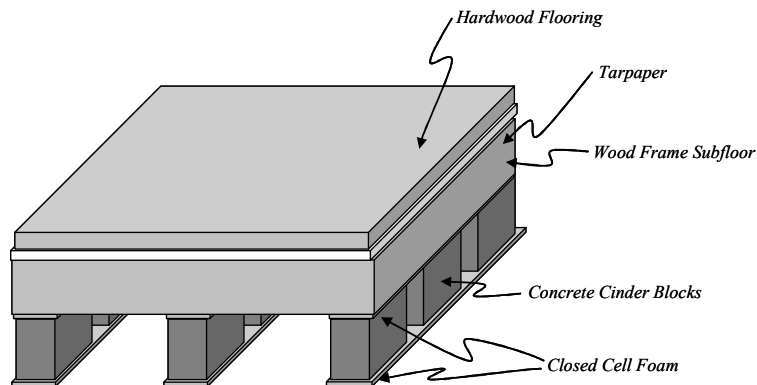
(c): Hardwood flooring / tarpaper / wood frame subfloor / floating installation (Sample 24).
